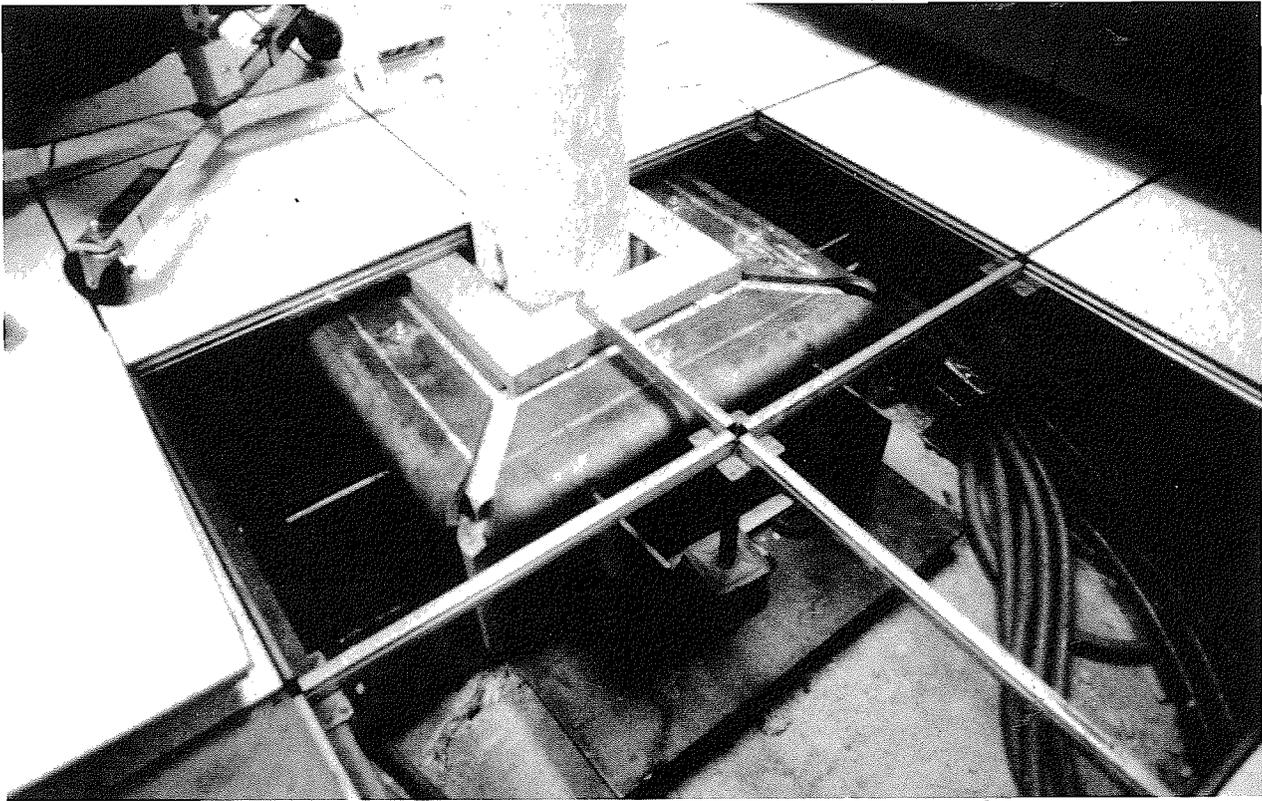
"Z-plate" used to transfer load of new post-tensioned slab (not yet poured when photograph was taken) to top of existing pile cap.
